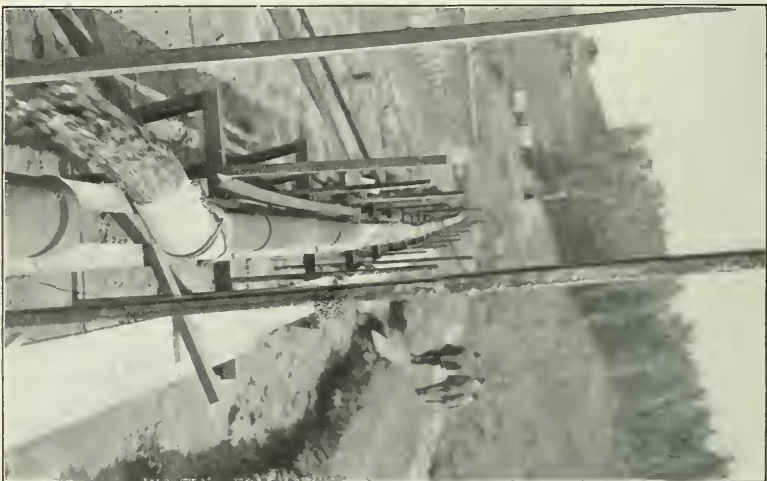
PIPE LINE DELIVERING EARTH FOR SILVER LAKE DAM.
